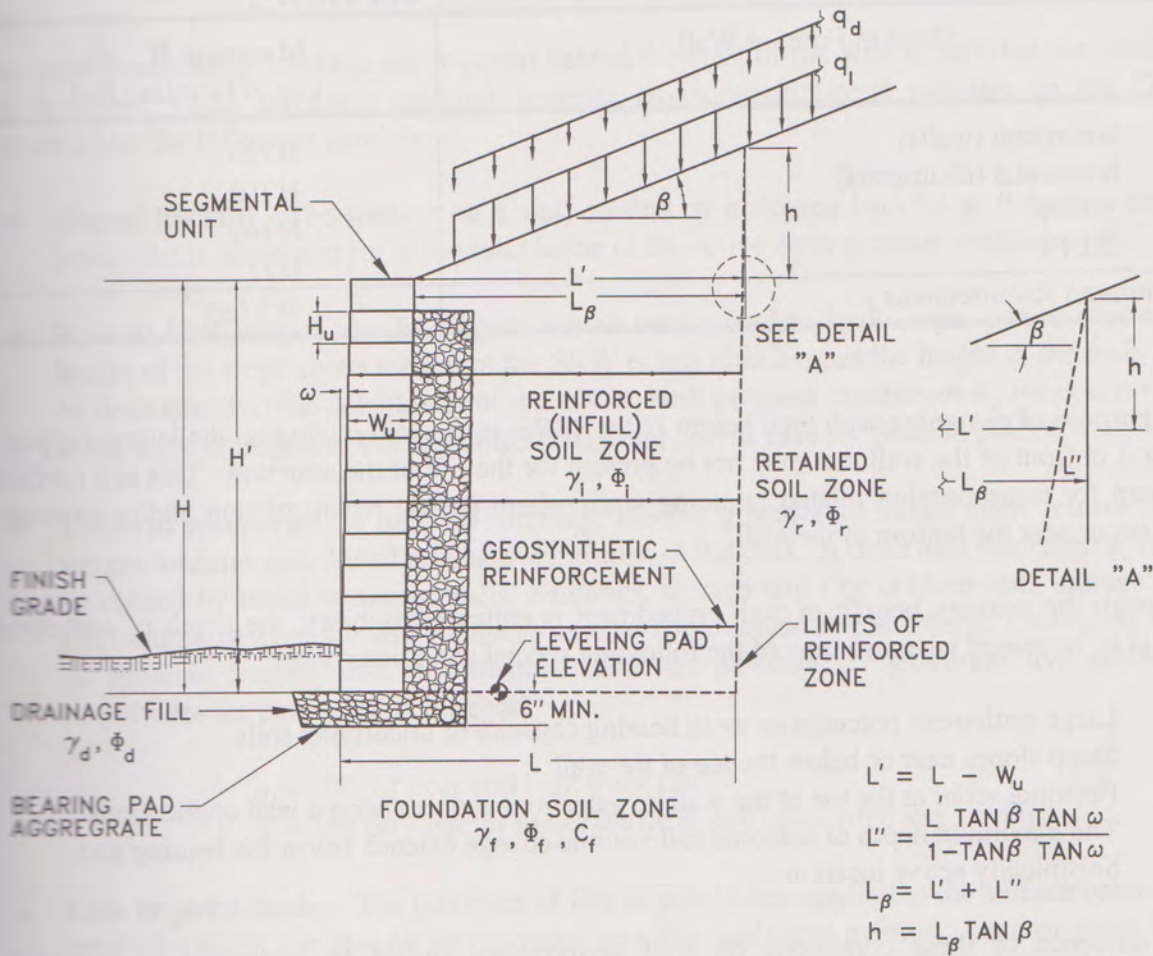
TYPICAL SEGMENTAL WALL PROFILE
